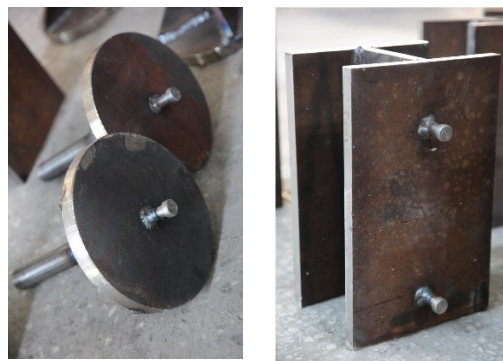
Steel structure parts of specimens (a) pure-tensile specimen (b) push-out specimen
